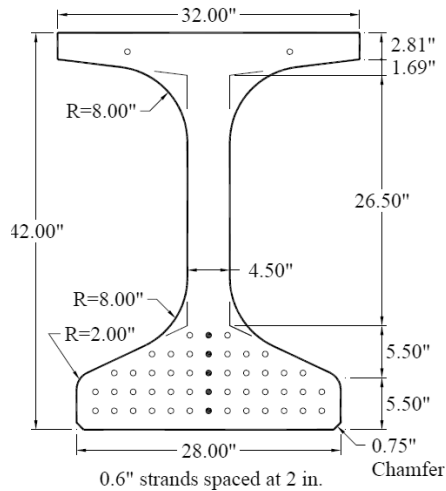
Cross Section of Modified Iowa Bulb Tee Girder (Wipf et al. 2009)
